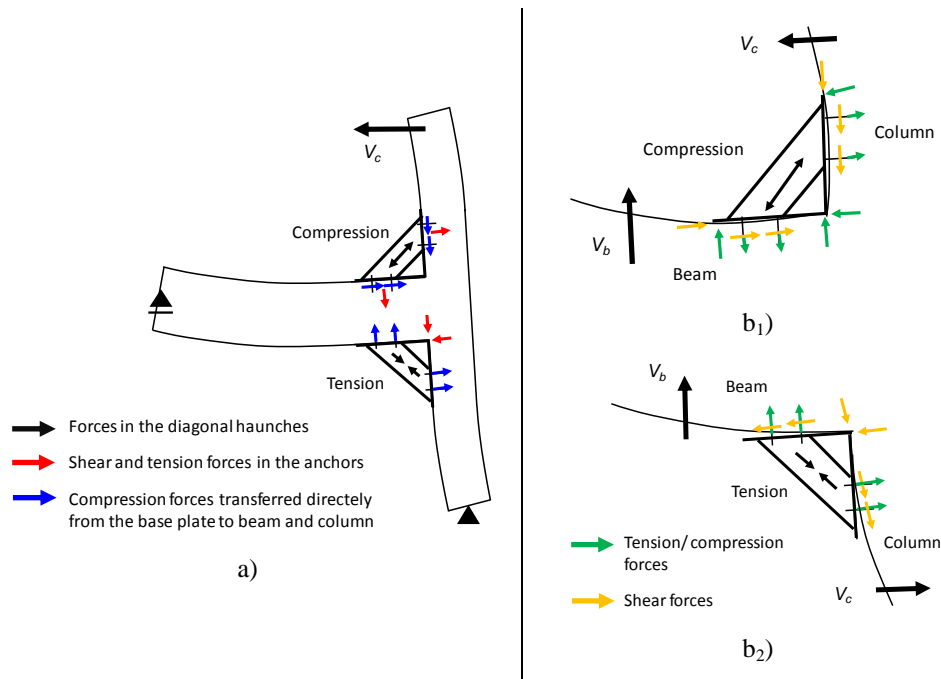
Possible approaches for the calculation of the stiffness of the haunches fastened with post-installed anchors (Genesio, 2011): rigid (a) and flexible (b_{1,2}) RC beam and column
